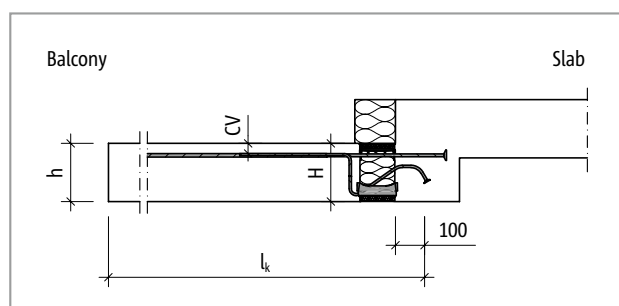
Schöck Isokorb® XT type K-U: Static system
